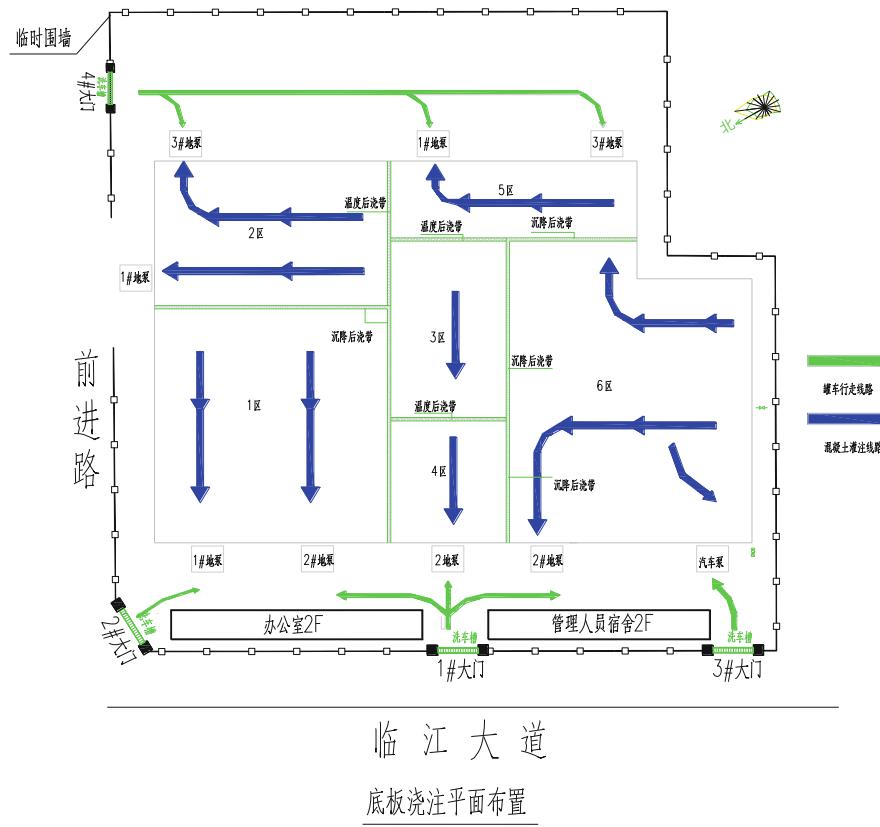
Logistics plan for concrete pouring of the 5A office building's foundation slab
